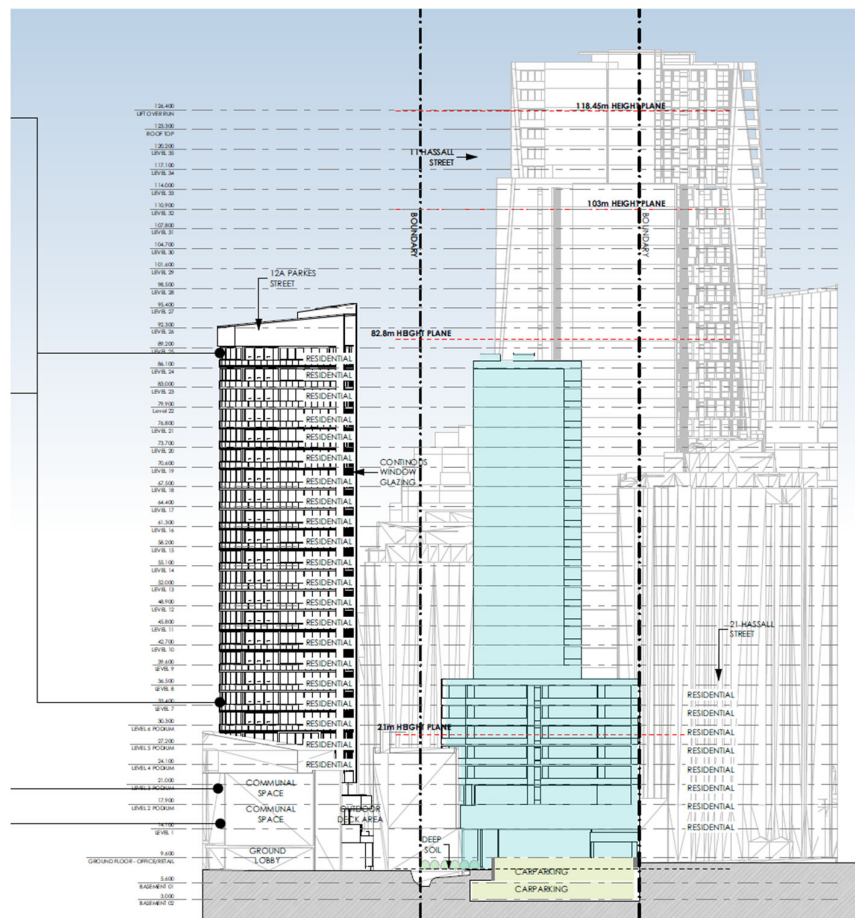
Building Achieved under Existing Height Controls (Source: PTI Architecture on behalf of applicant)
